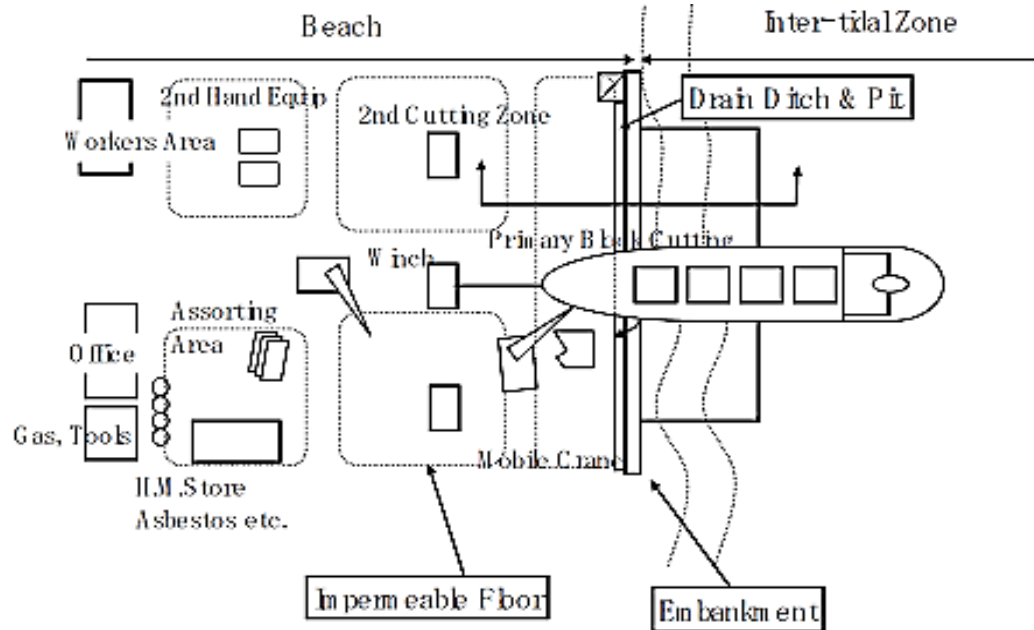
Plan of Improvement of Existing Ship Recycling Yard
